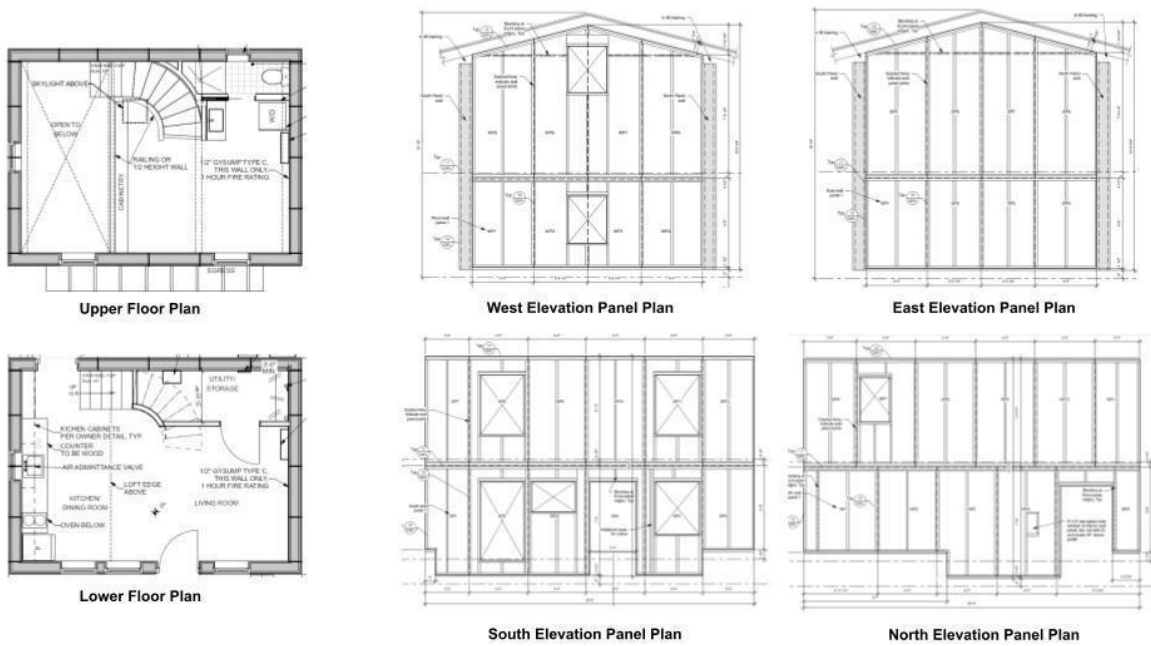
Upper & lower floor plan and elevations illustrating modular panel layout
